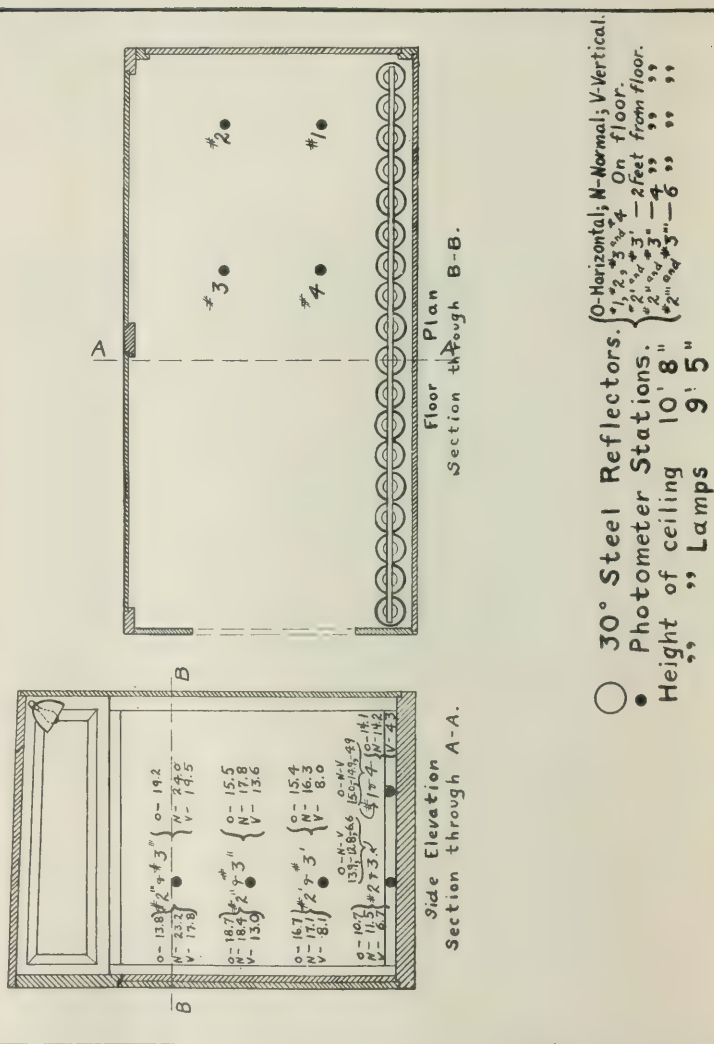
Section plan of typical window, showing location of furnishings, lighting units, test stations and illumination data.
